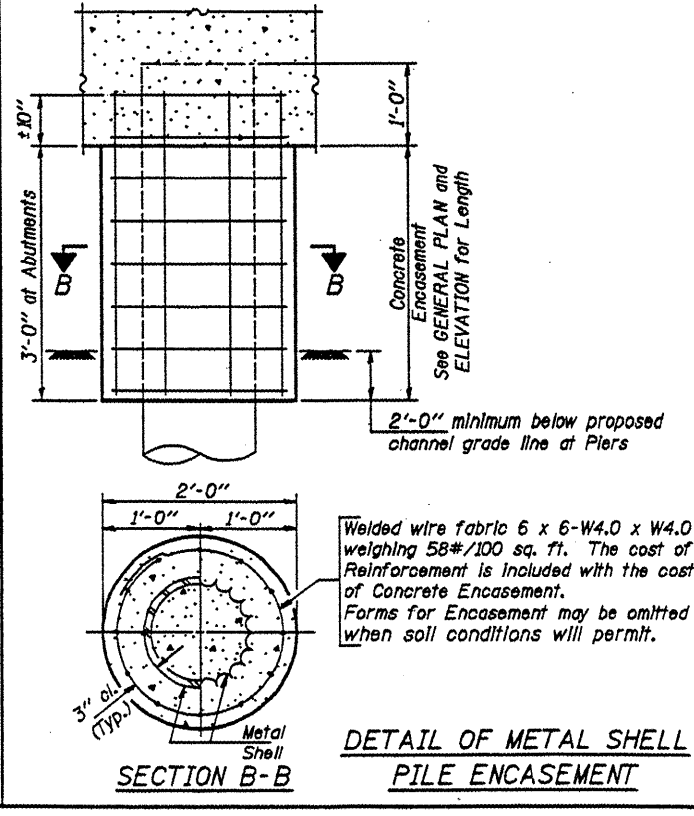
DETAIL OF CYLINDRICAL STEEL SHELL FOR CAST IN PLACE CONCRETE PILES
